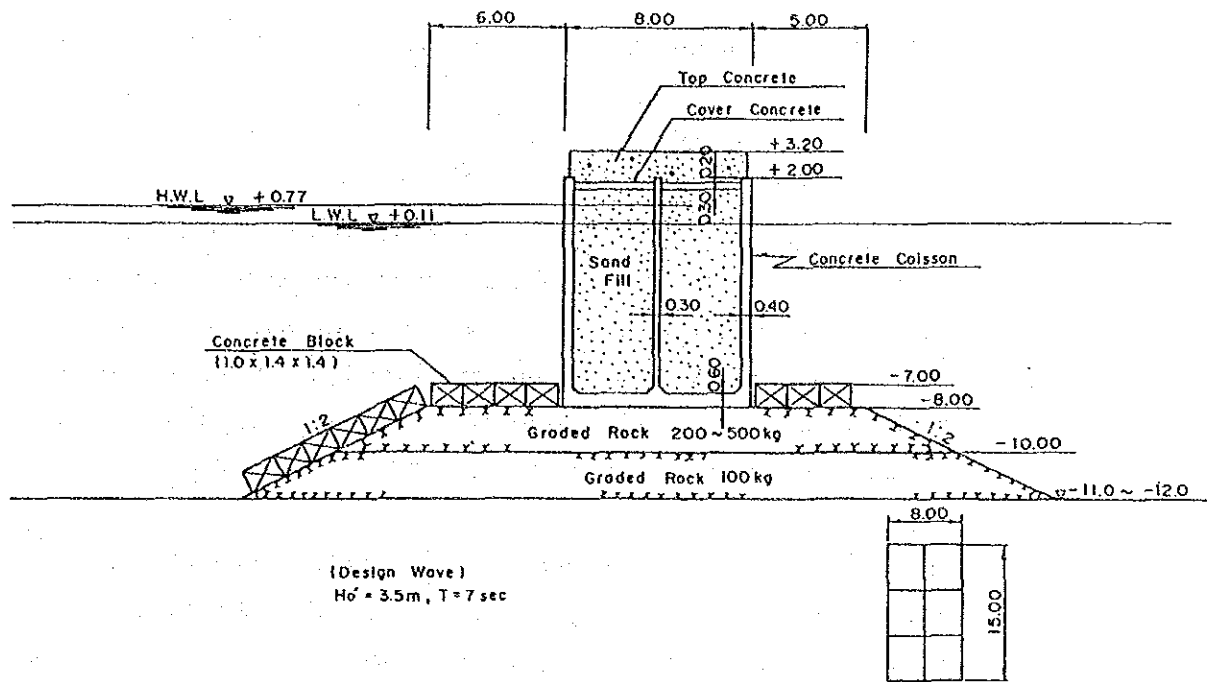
Extension of Northwest and Northeast Breakwaters (Concrete Caisson Type)
